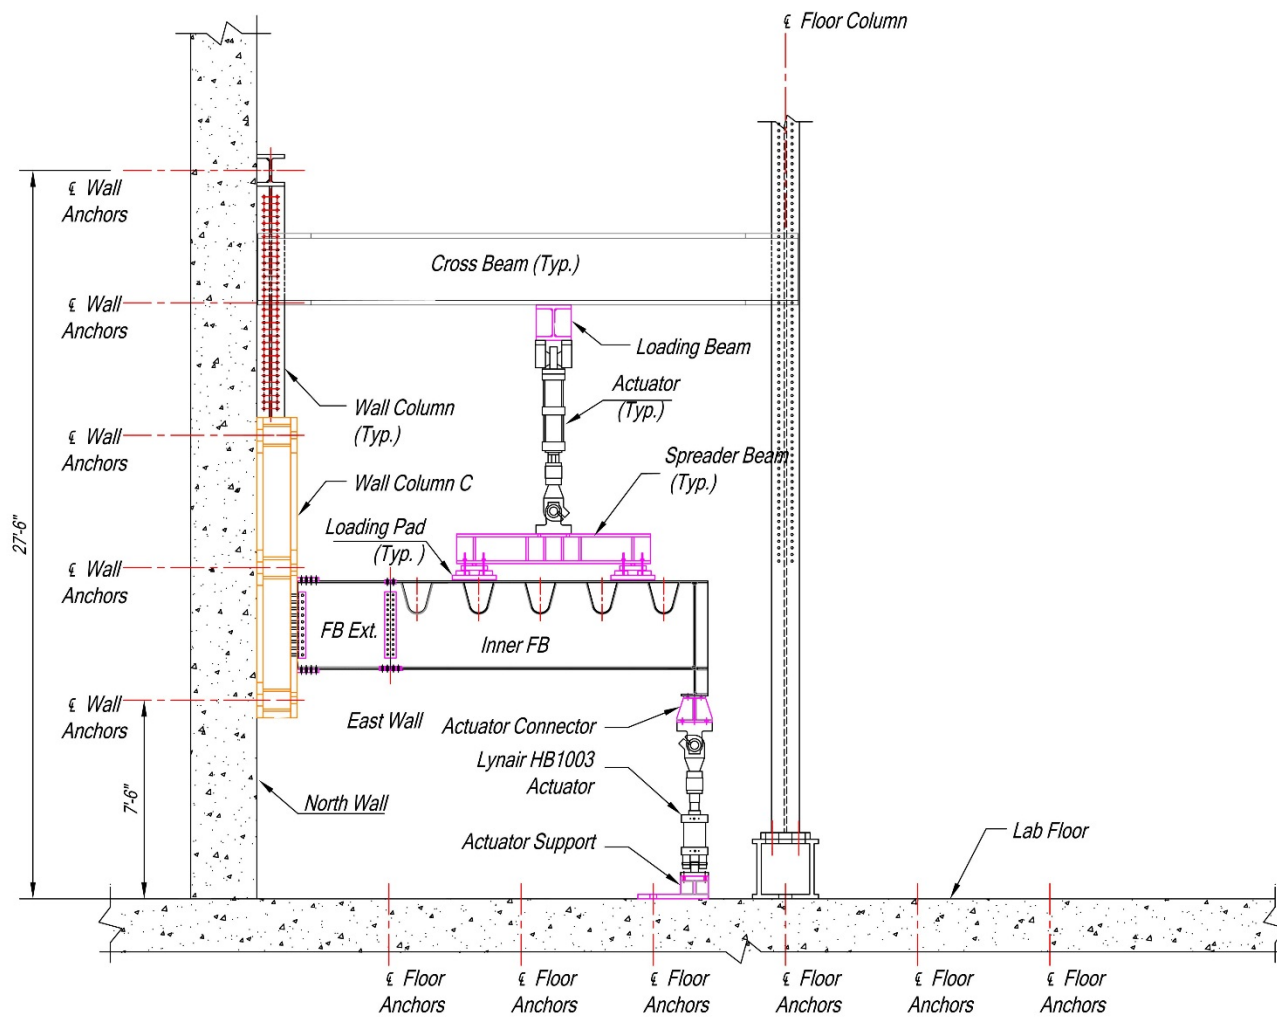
Sectional elevation of the test setup at the inner floor beam (looking east)
